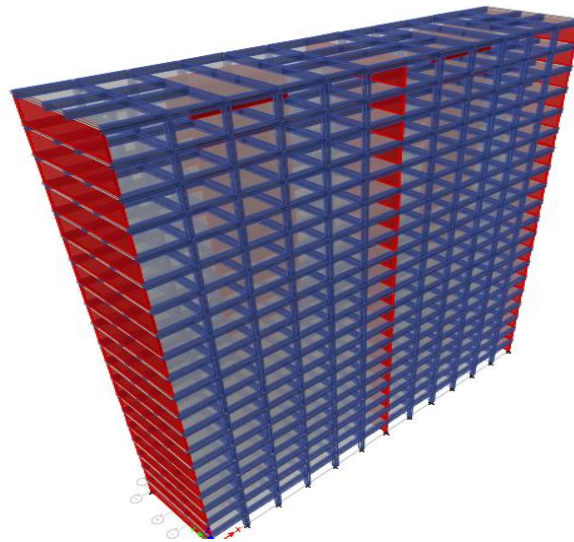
The building 3D-model of the 60 m length, 20-storey height
